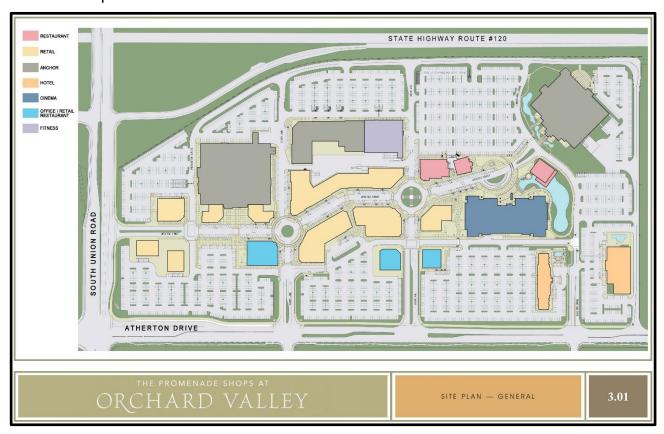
Original Planned Development Site Plan Showing Land Uses per Building
